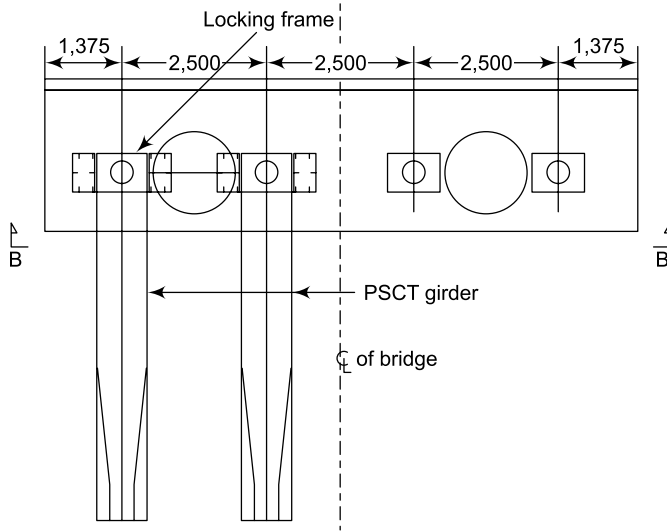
Part Plan For Girder Restraining Arrangement (Restraining arrangement at the other end of girder is same and thus not shown.)
